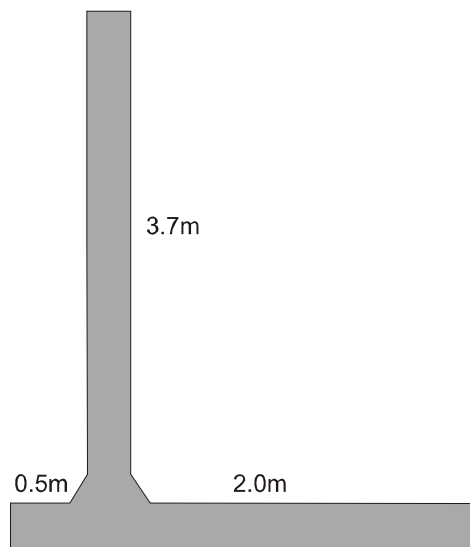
Example of how pre-cast concrete slabs can be used alternative to sheet piling of the breakwater and quay wall. The technique is commonly used in the Maldives instead of cement-bagged breakwaters.
